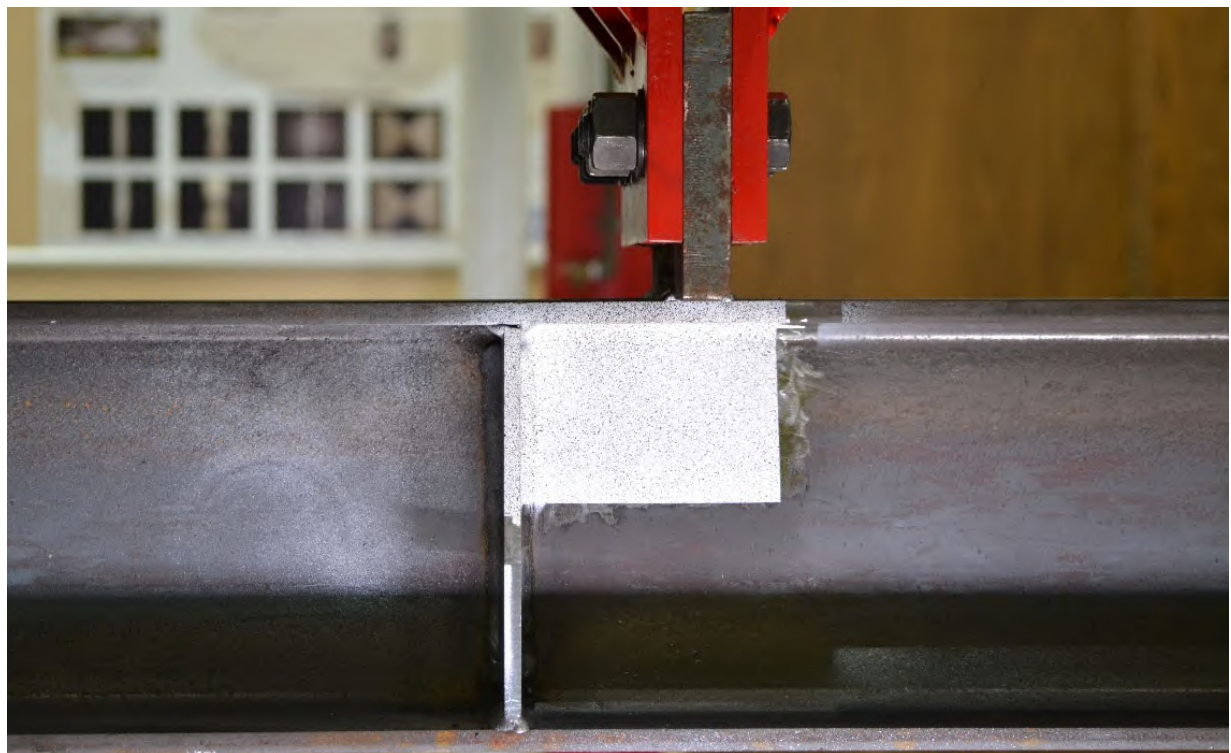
Weld condition of W10X39-ST-NA after testing (Side 1)
